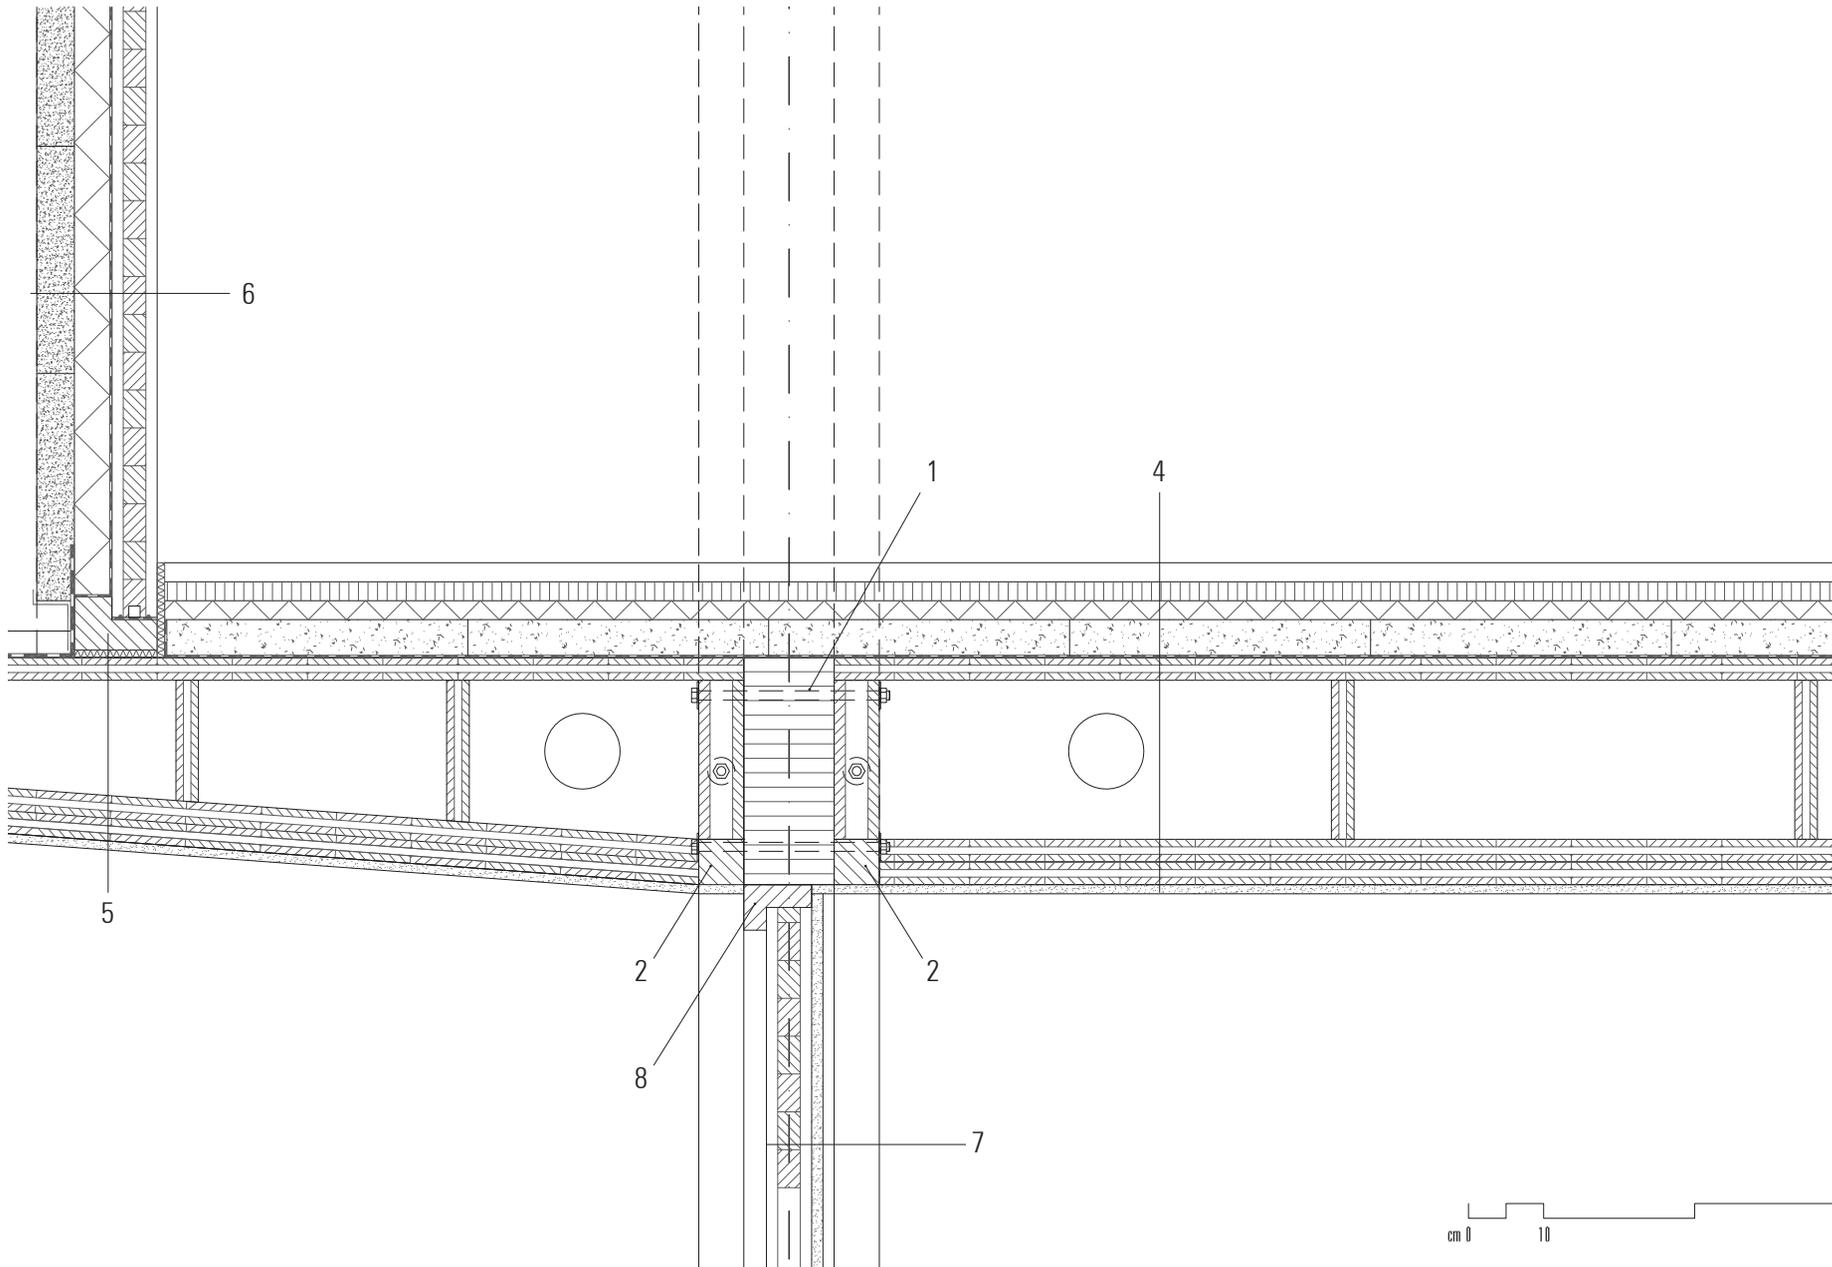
| DETAIL 2 | DETAIL 3 | DETAIL 4
